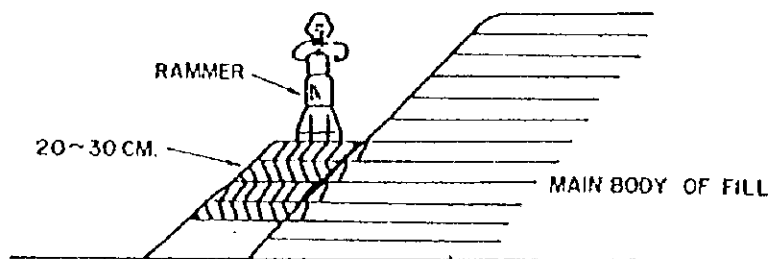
Slope Compaction with Tamper or Rammer
